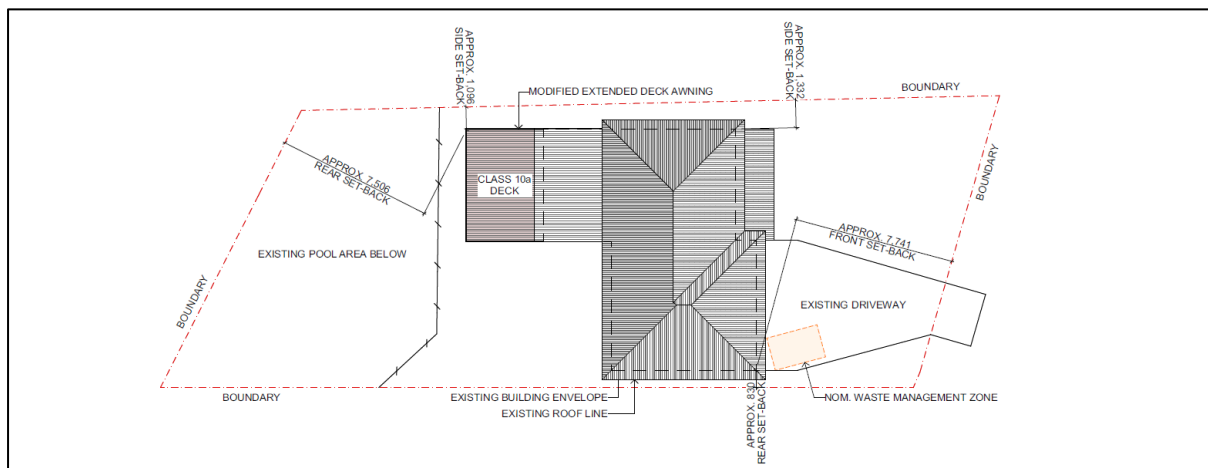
Site Plan (Matthew Baker Building Design, Drawing D103, Issue 04, dated 14 July 2026)
